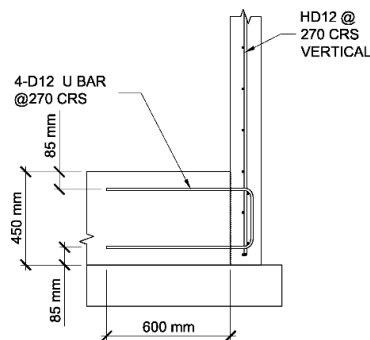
Detail of a conventional starter bar connection (Panel U12-C50)
